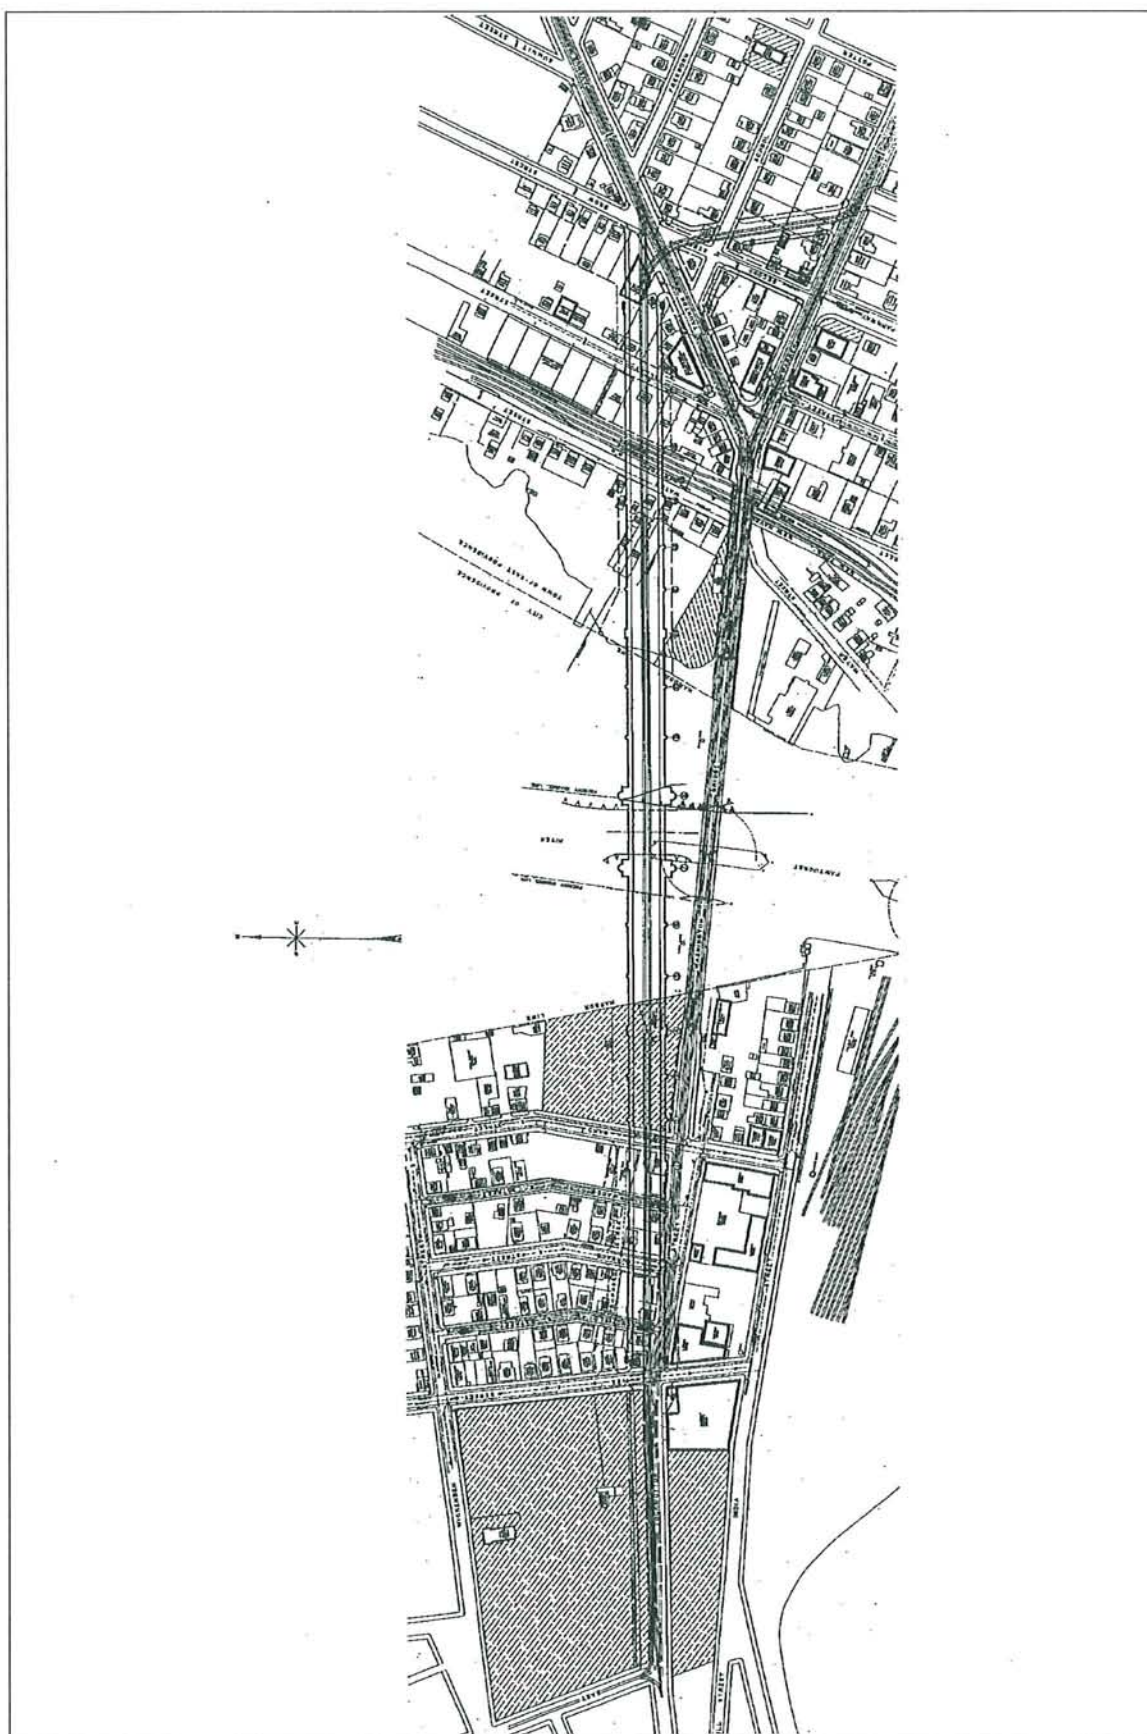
Plans depicting the 1885 Seekonk River Bridge and the proposed 1930 Washington Bridge alignments.
